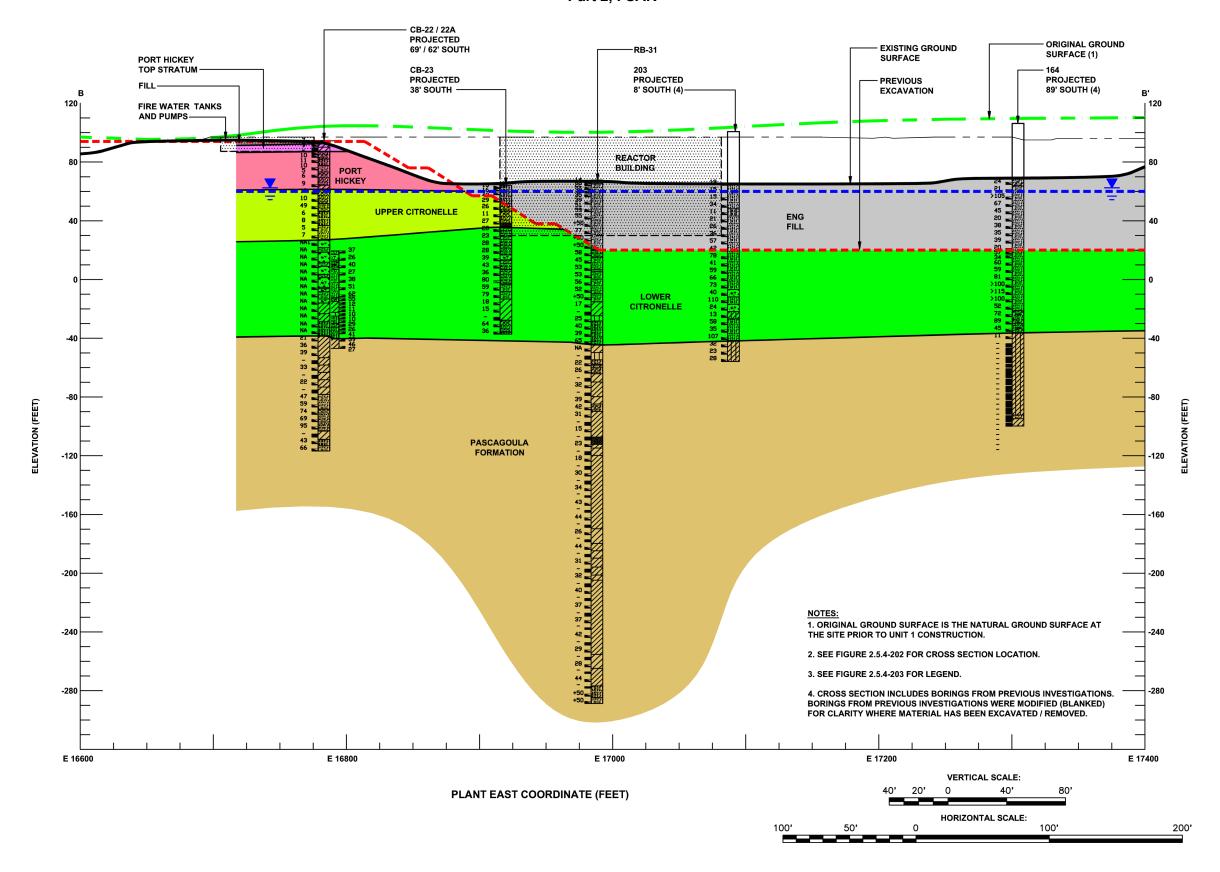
Cross Section B-B' Through RBS Unit 3 Site Location
